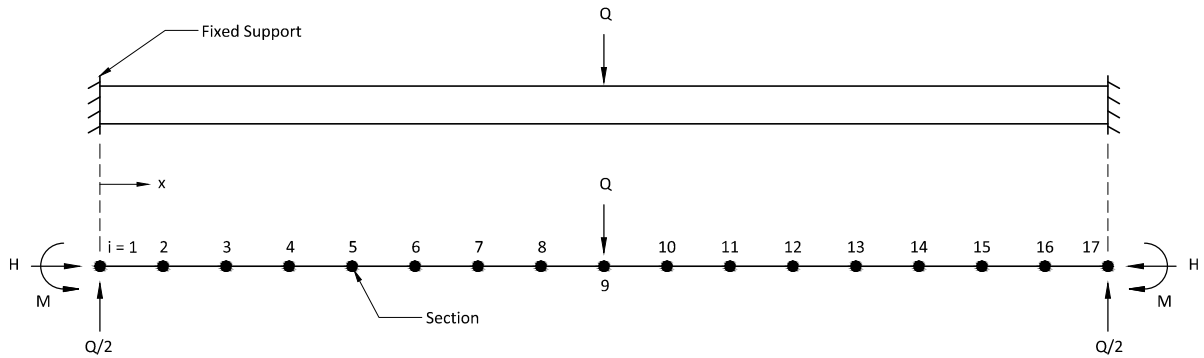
Sections considered throughout a beam with a concentrated load.
